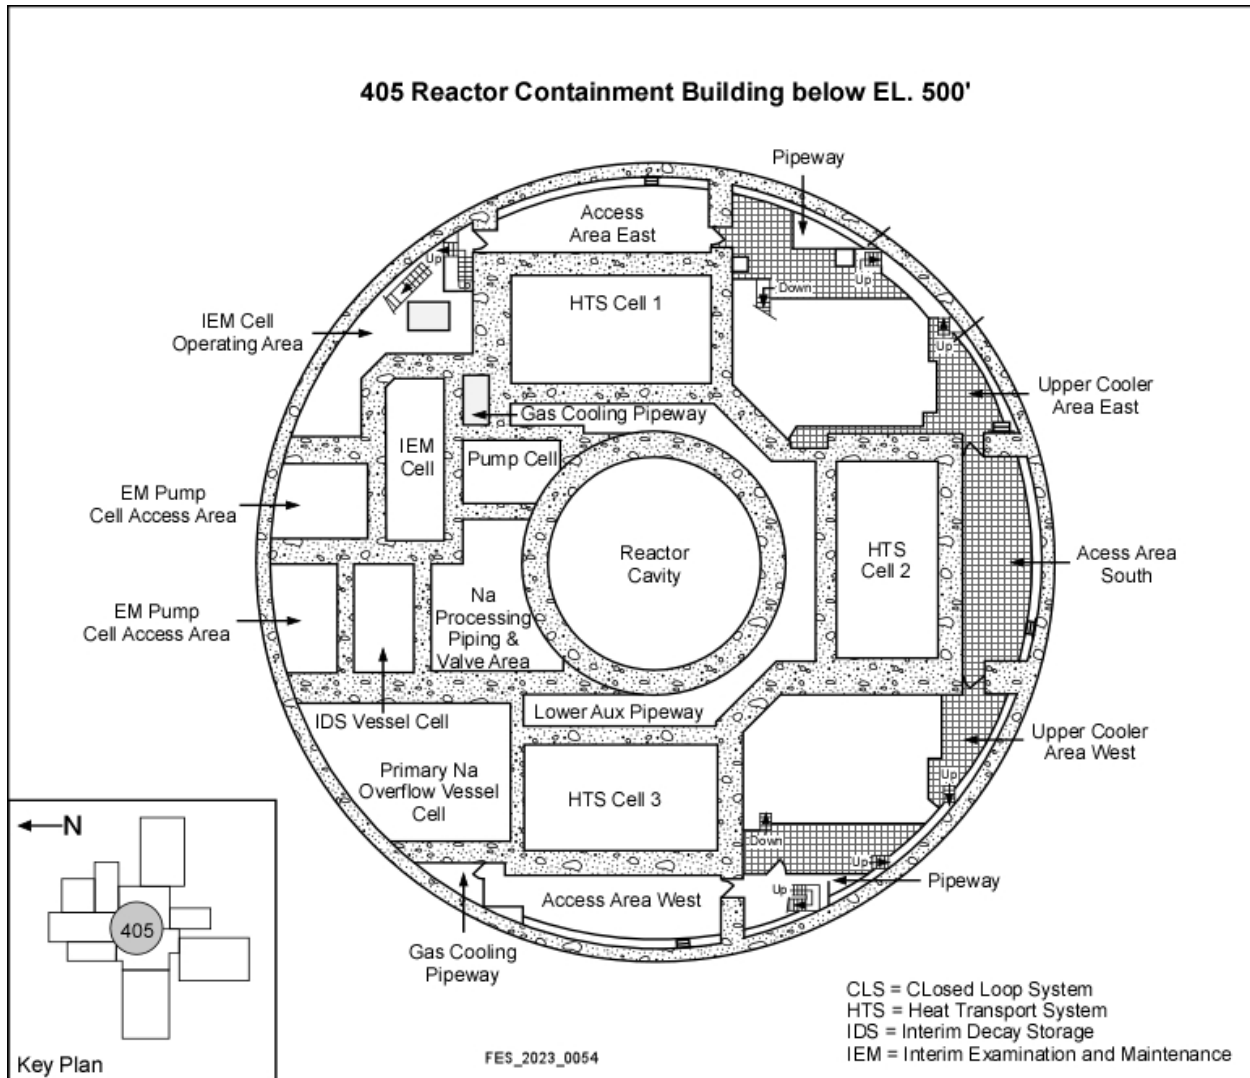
Plan View of 405 Reactor Containment Building (Below 500 ft Elevation)
